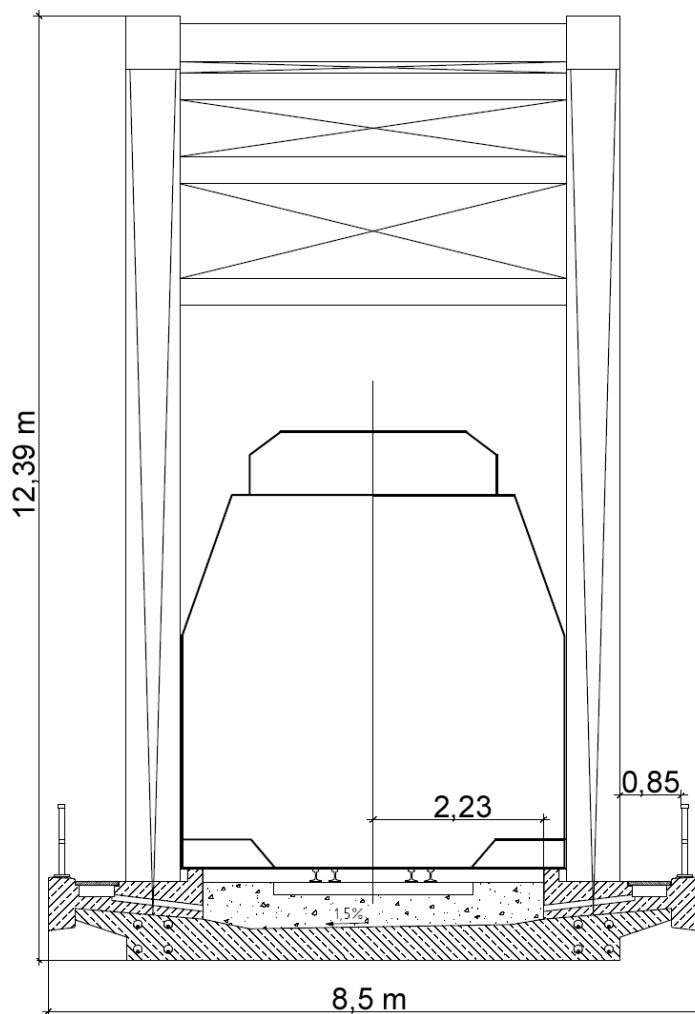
Shows an early suggestion by Prof. Marx for a cross-section of the railway bridge over B6 at Halle
